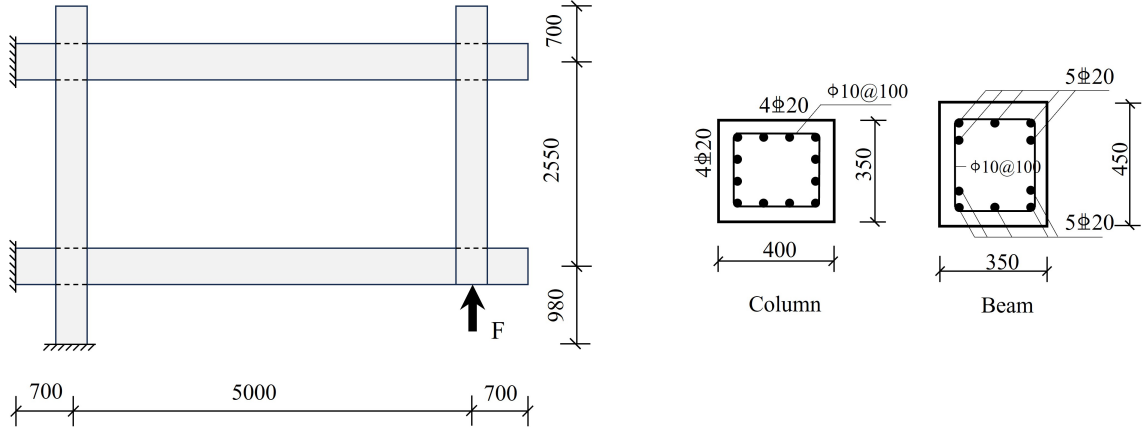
Load layout and geometry of the studied RC frame (Unit: mm)
